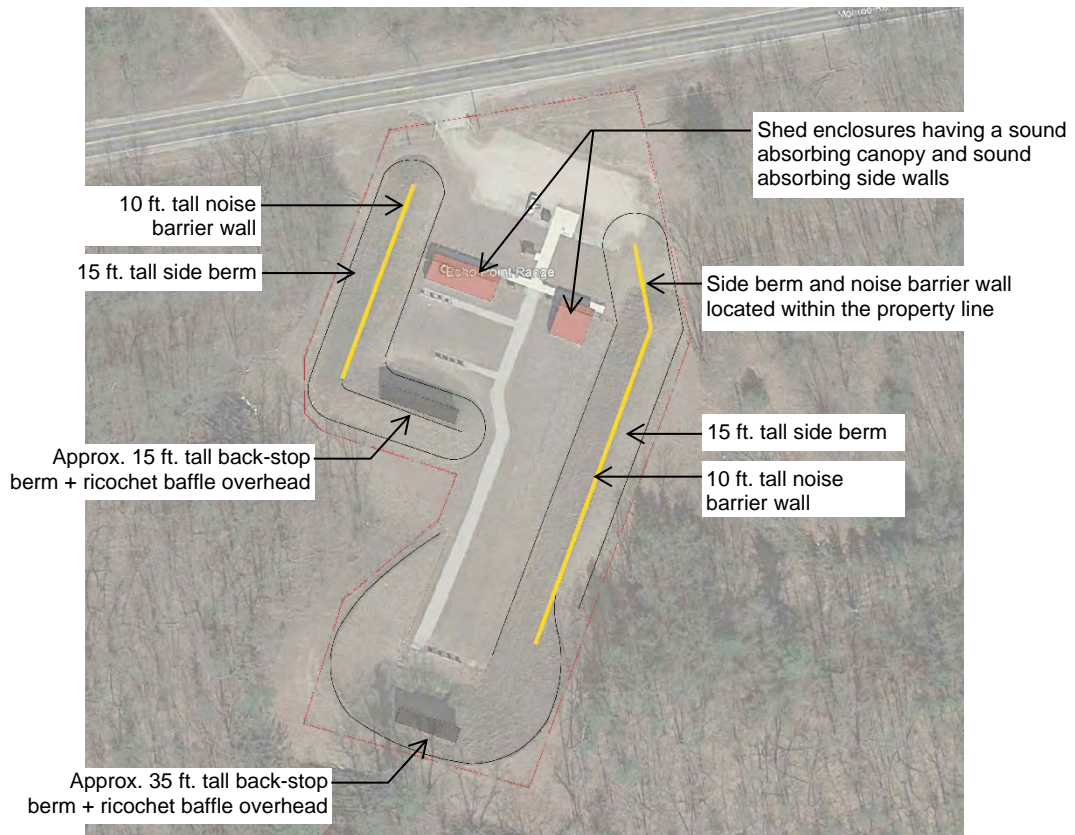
Concept plan diagram of the base range with noise barrier walls above the side berms | Model C
